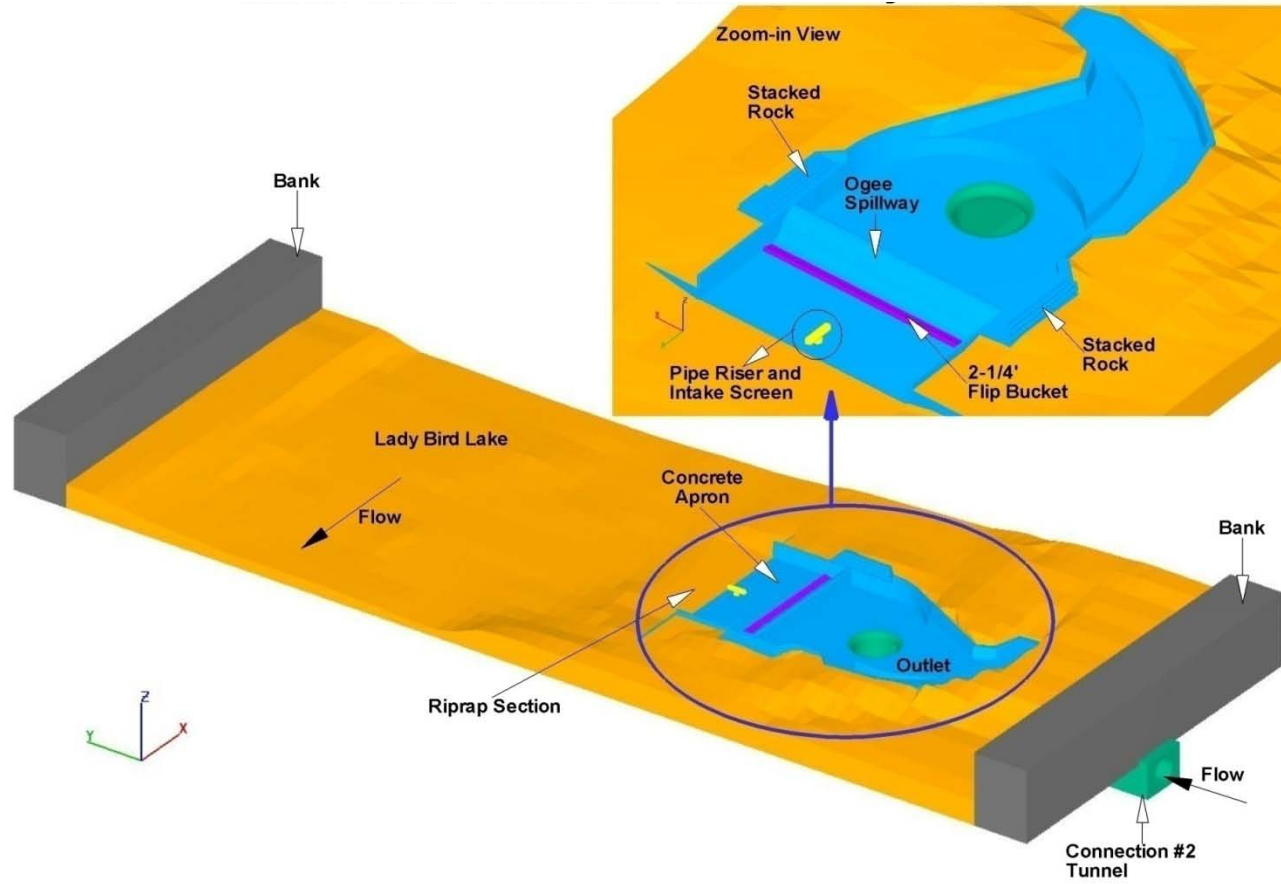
Waller Creek Tunnel Project; Outlet CFD Model
